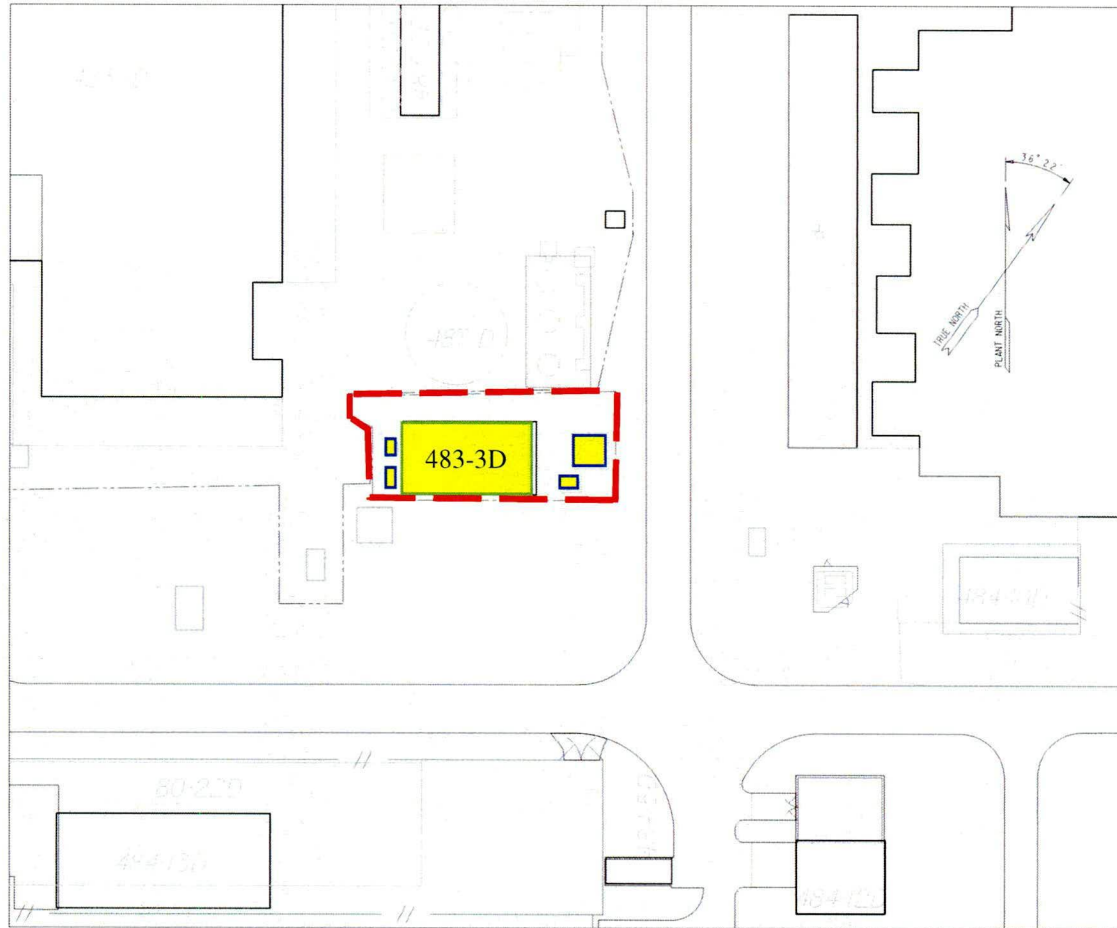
Building 483-3D, D-Area Electrical Control Building (FDE boundary in red)
